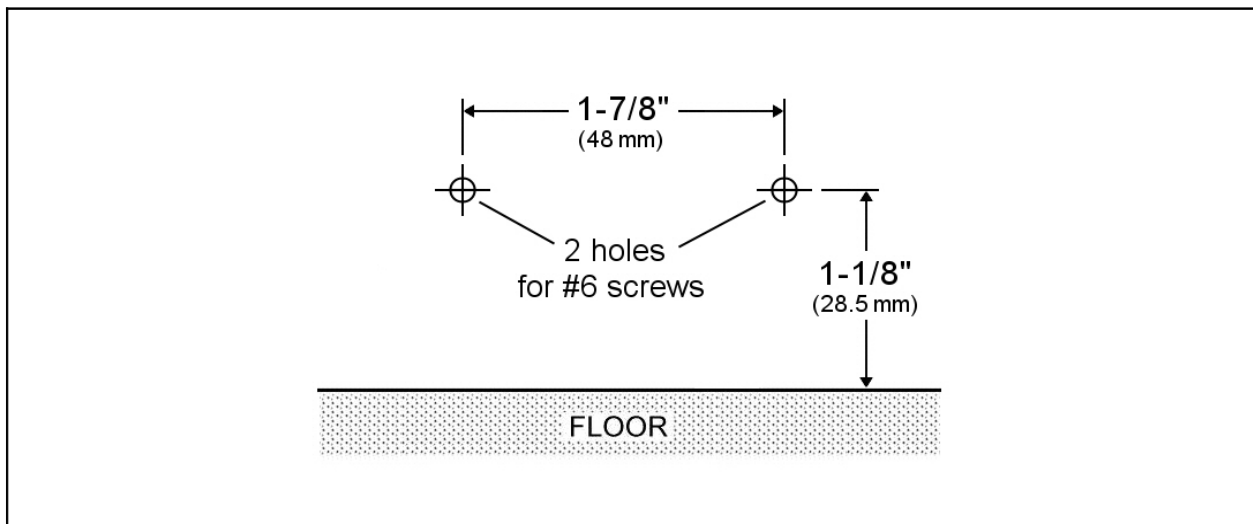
Dimensions of wall mounting screw holes for the ATI-5005F sensor.
